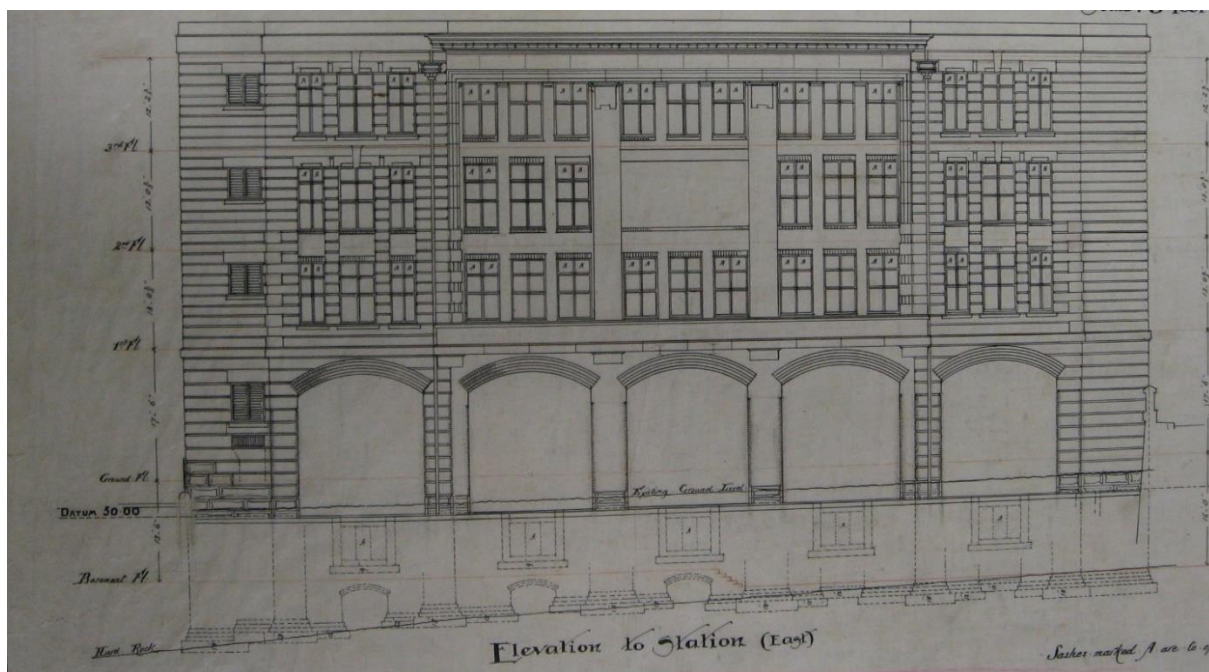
Detail from Sheet 4, Elevation to Station (east): New Parcels Post Office Premises at the Central Railway Station Sydney, 1910 (showing the original four storey elevation).
